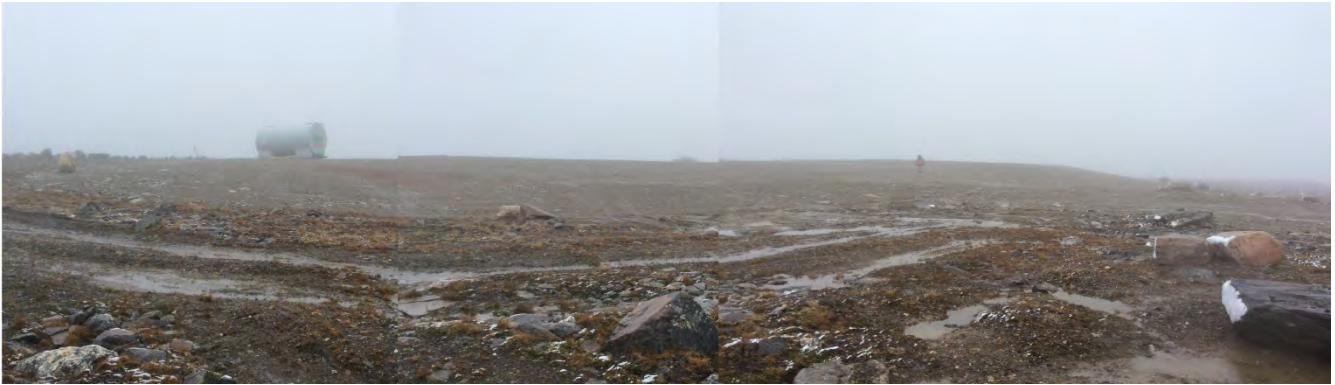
Station West Landfill, Lobe A – Northeast end facing south, ponded water at toe (previous Feature V) (ATT181\_Photo1.jpg) (ATT182\_Photo2.jpg) (ATT183\_Photo3.jpg)
